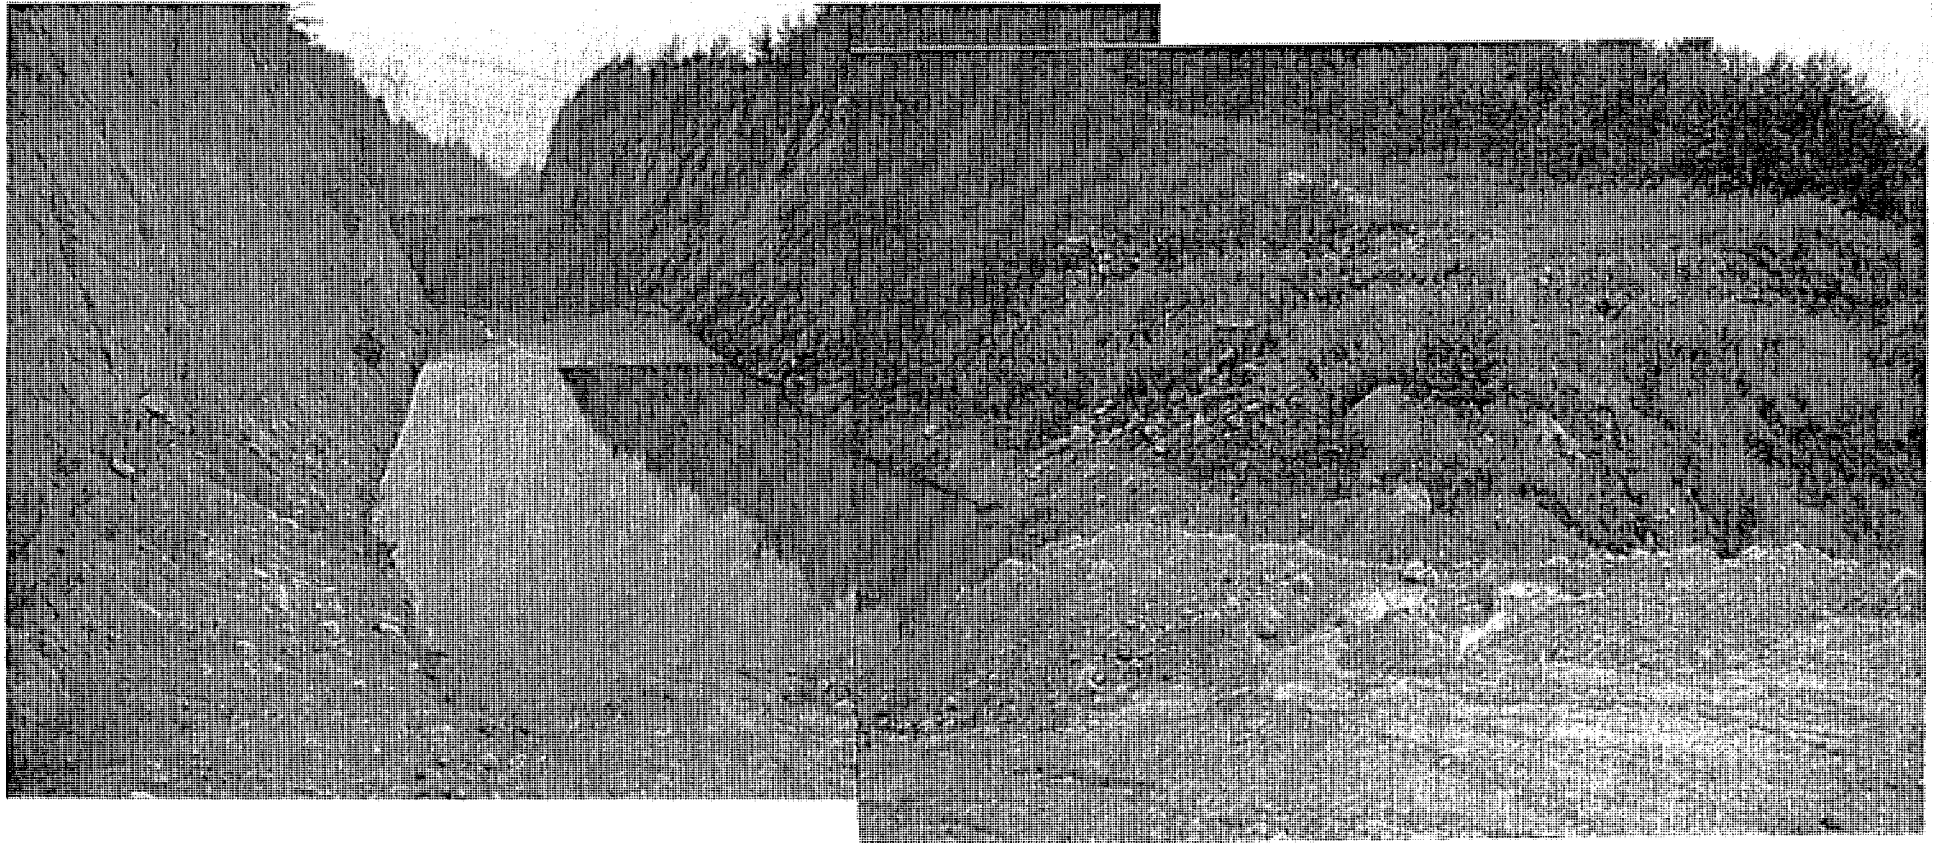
Middle Sand Mine. View looking south. Landfilling with screenings from Associated Gravel - Issaquah Pit. Water ponded in bottom of pit. Fill materials end dumped from top of cut on left. Fines migrated into ponded water below fill.
